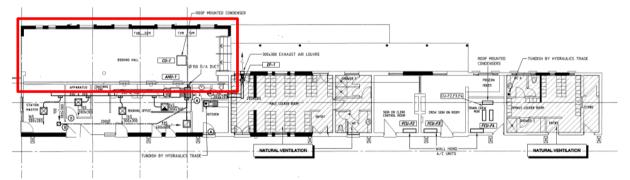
Plan of Platform 3 Station Building showing existing layout. As built 22 December 2000. Source: Sydney Trains Plan Room CV0023836. Approximate area of works highlighted. Note: Kitchen has been demolished.
